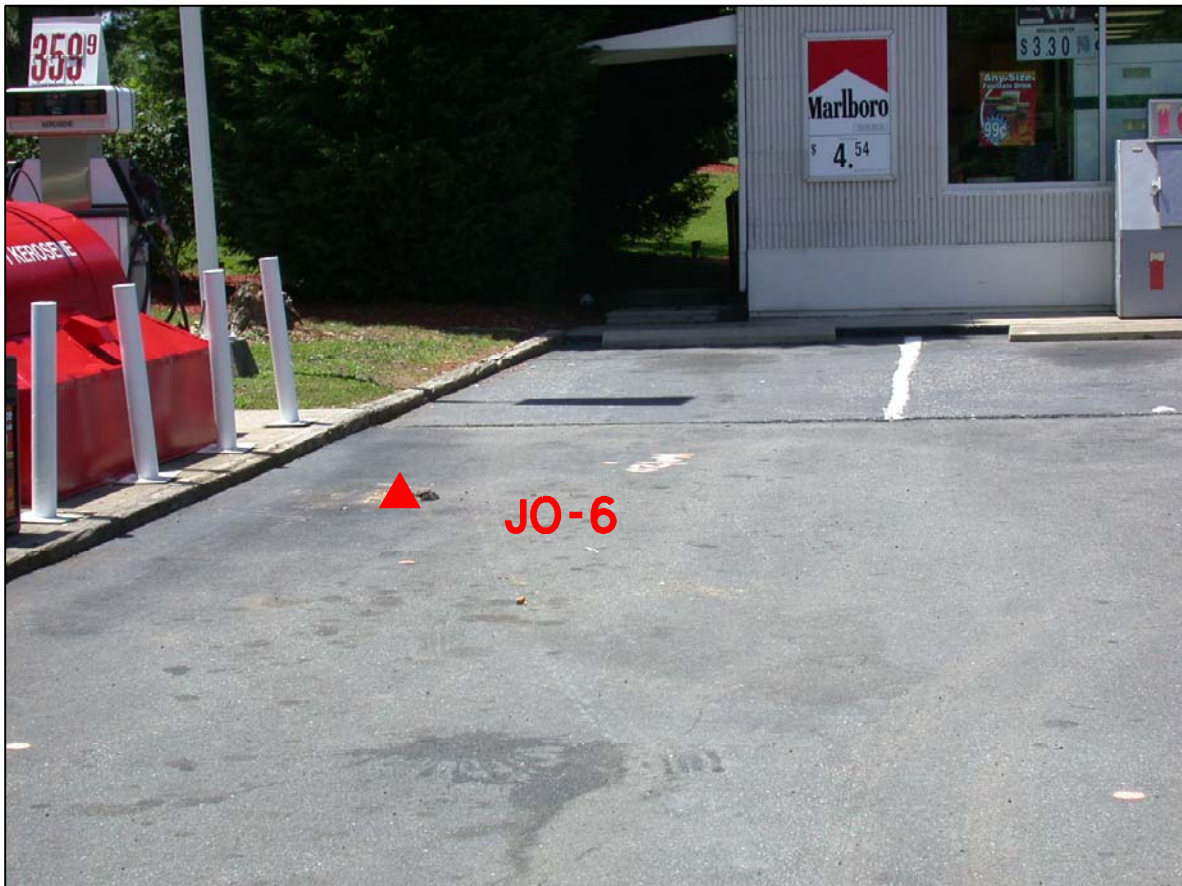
BORING WITHIN PROPOSED R/W LOOKING WEST
